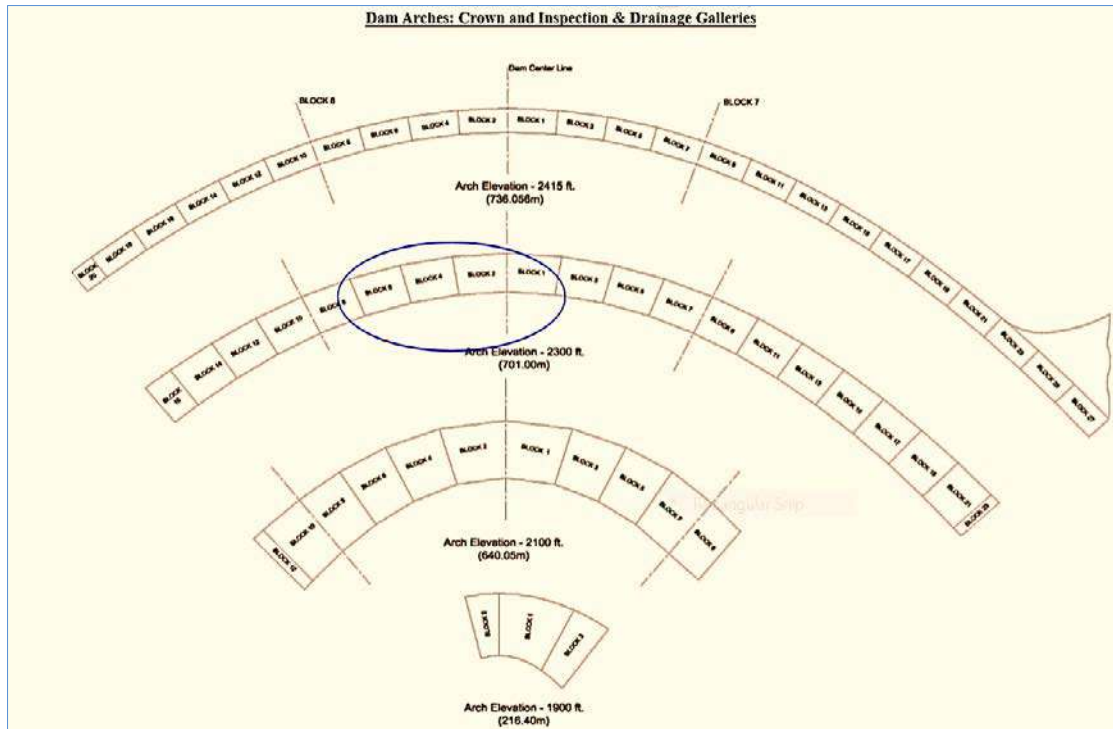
Arch cross sections of Idukki dam at elevations 1900', 2100', 2300', 2415'
